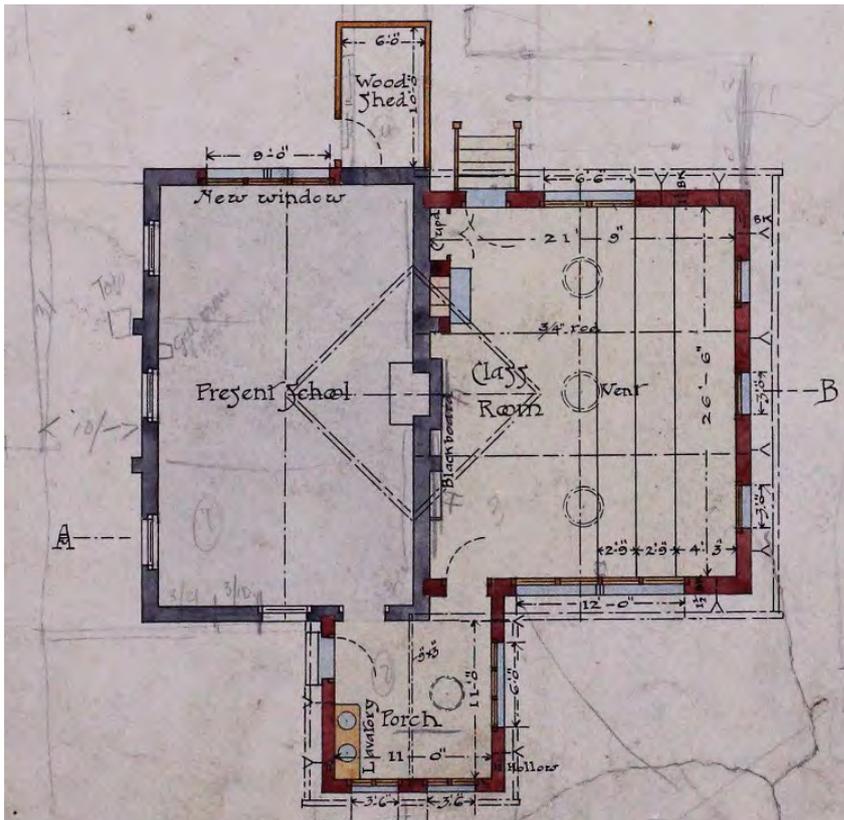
Floor plan drawn for the 1907 addition. (Source: PROV VPRS3686/P7/958)
